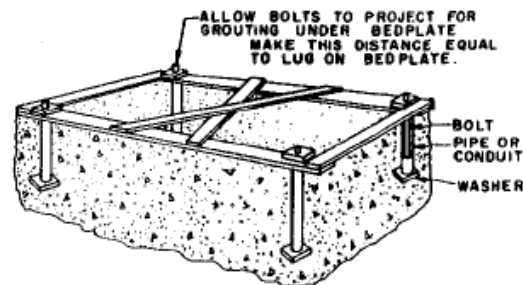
TEMPLATE FOR HANGING FOUNDATION BOLTS WHILE POURING THE FOUNDATION.
